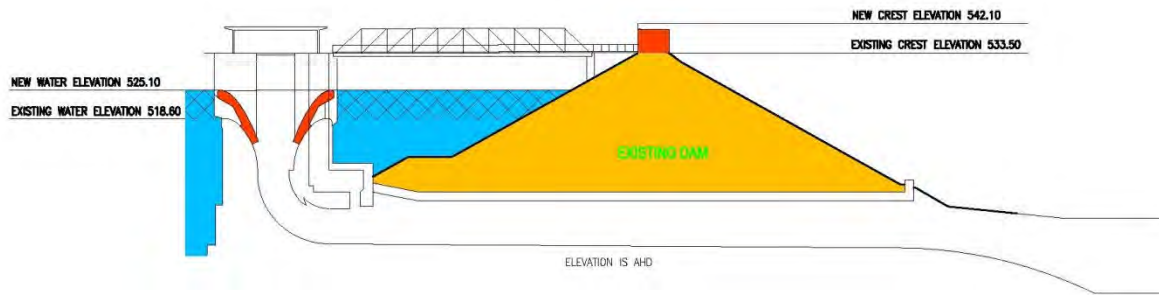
Revised construction methodology on the Chaffey Dam wall
